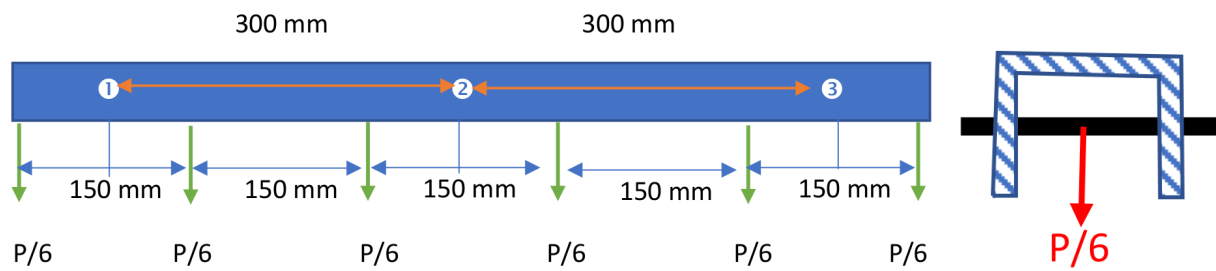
SPIT PULSA systems: Multiple fastening of drywall tracks with ballistic nails HC6-15 and HC6-17 – prinzip drawing
